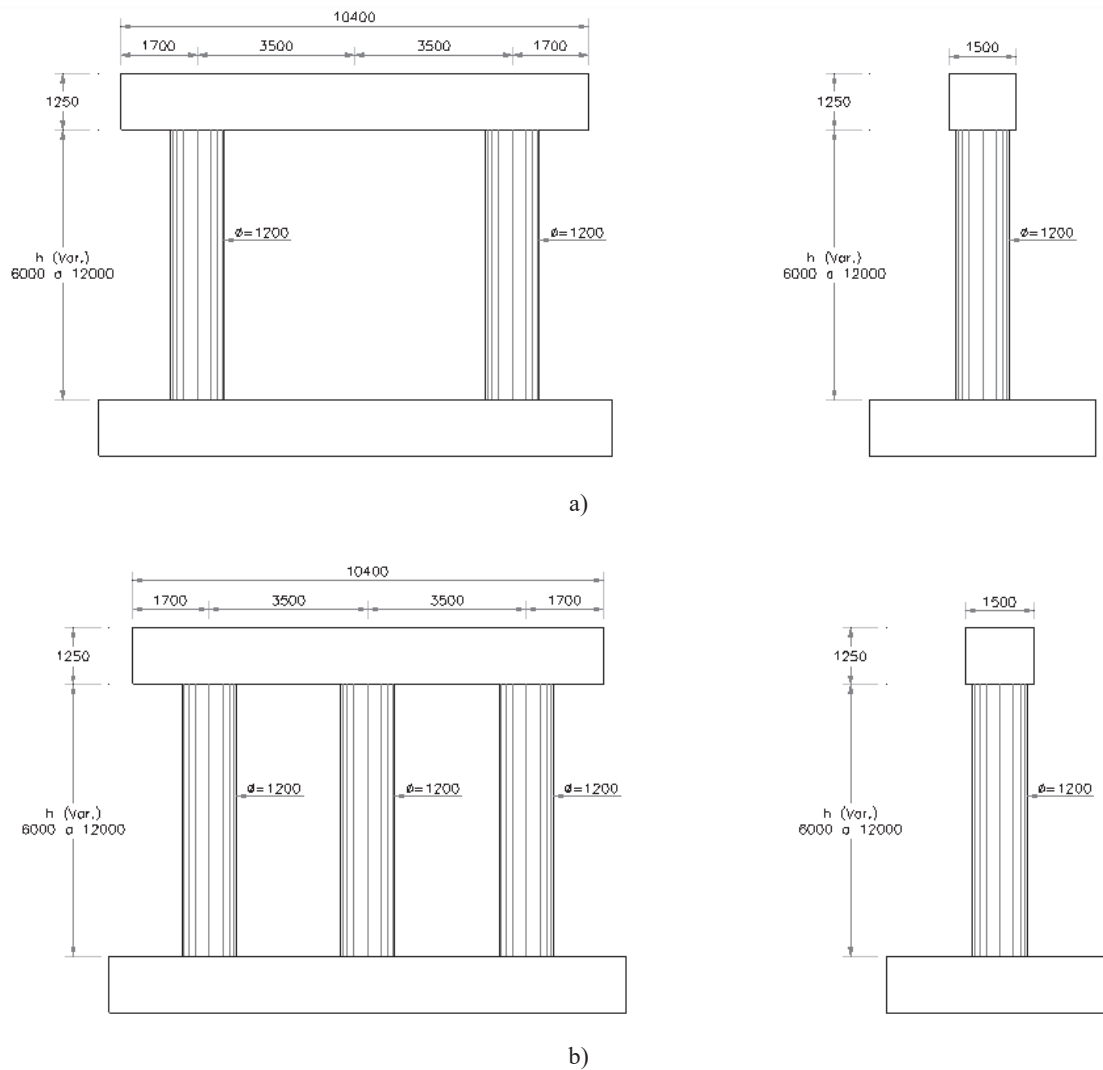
Typical section of the substructure. a) Type I - 2 columns. b) Type II - 3 columns
